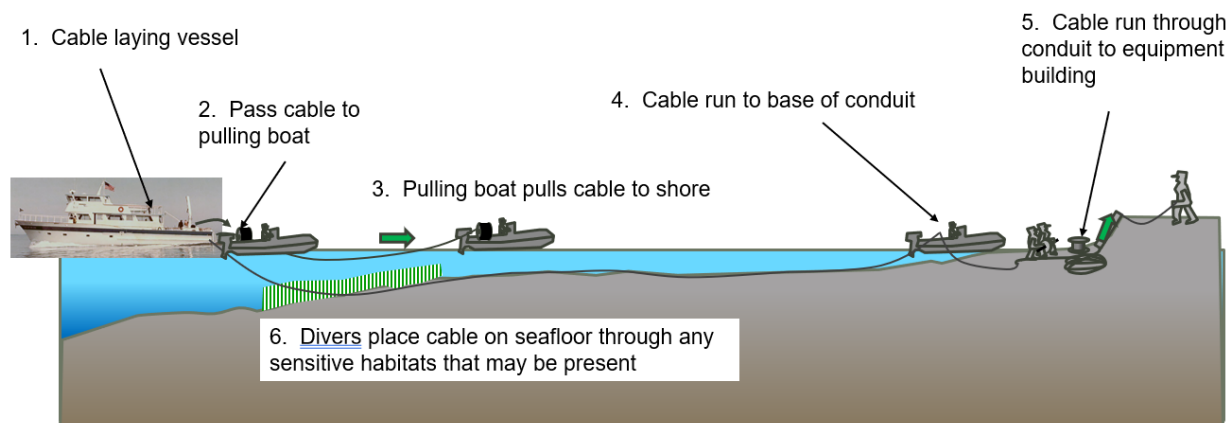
Example of Cable Laying Shoreside Landing Installation Plan
